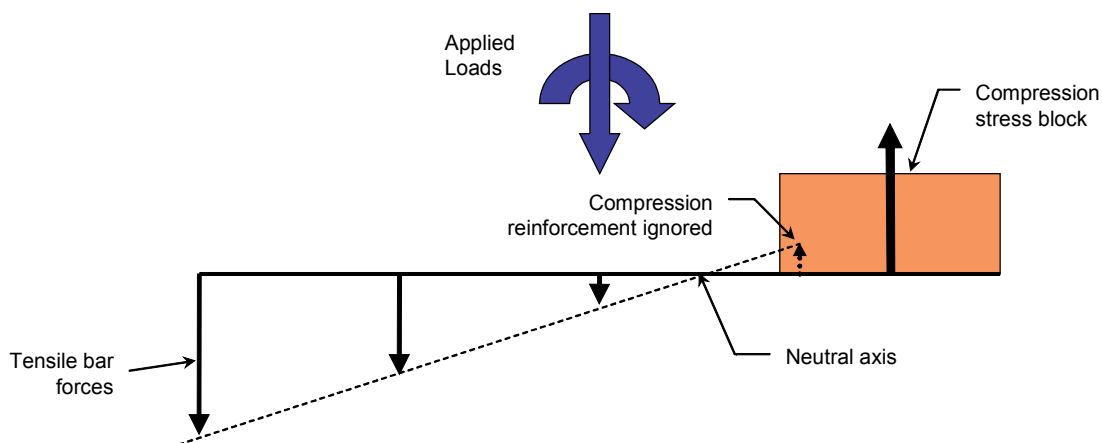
Equilibrium Calculation for Forces at Base of Bracing Wall
